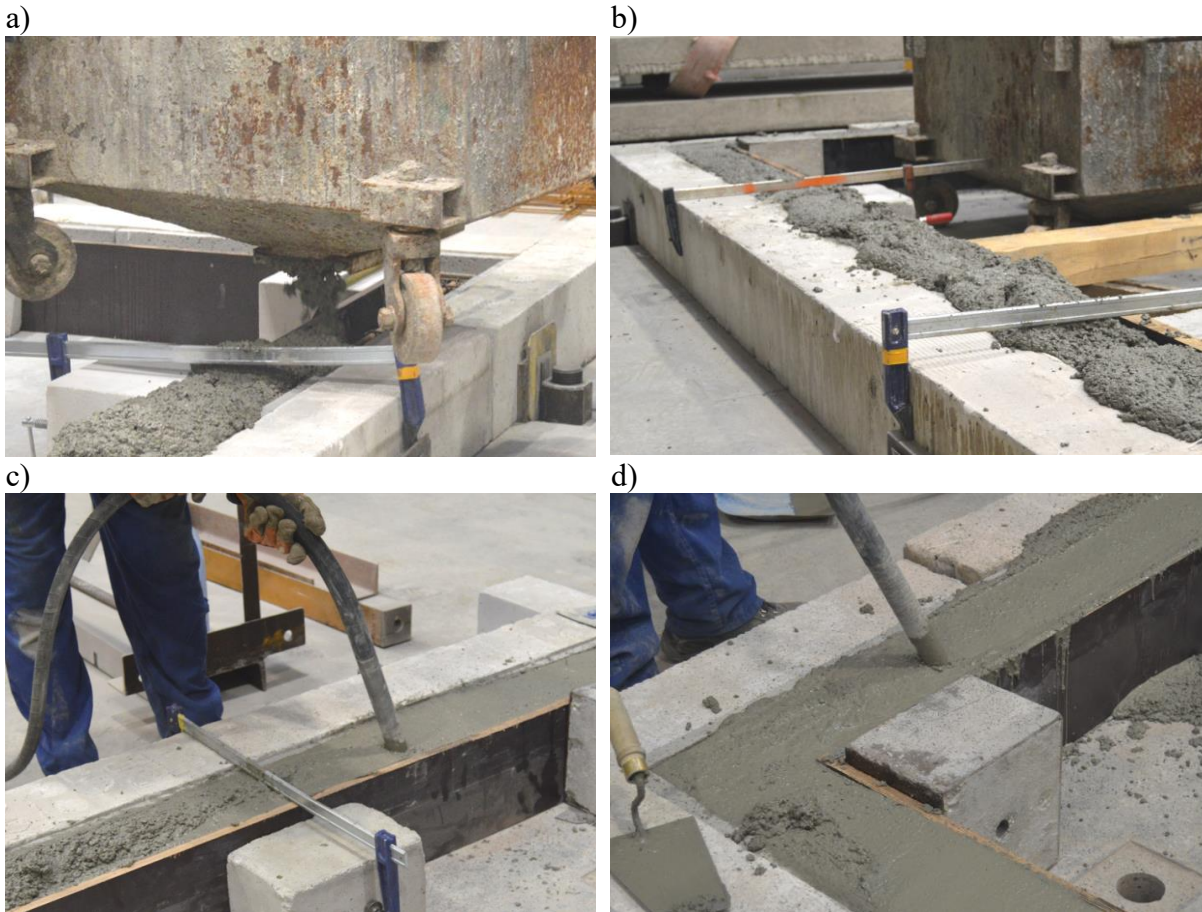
Concreting the bottom beam: a) concrete bucket, b) laying the concrete mixture, c) and d) compaction of concrete with a vibrator
